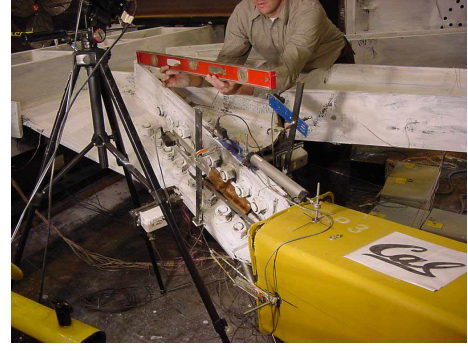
Lateral Buckling of Brace due to Fracture of Bottom Flange and Web of Beam, 2.6% Drift, Test No. 3
